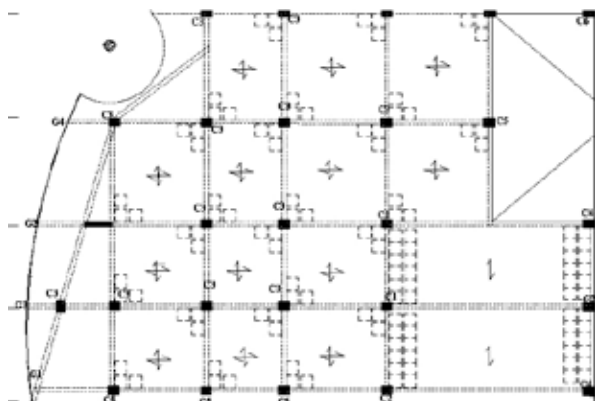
Cantilevers of 3 m and 6 m in the western side of the structure
